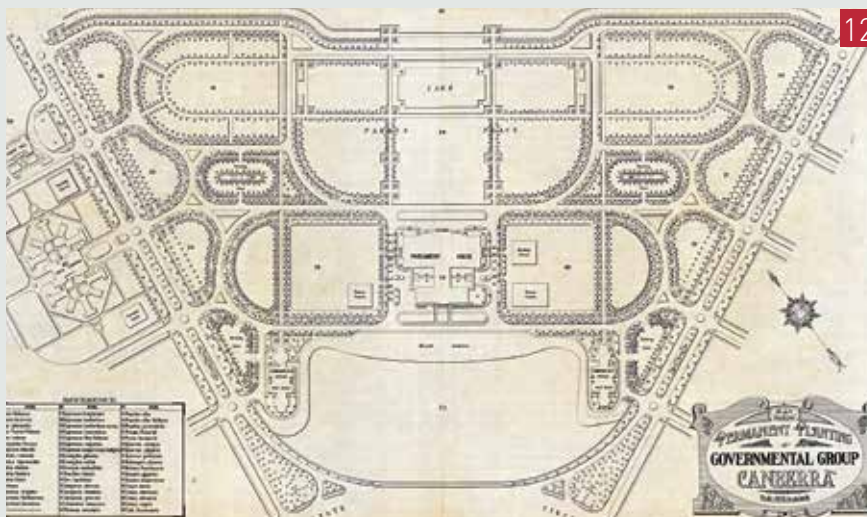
Plan for Permanent Planting around Parliament House between Commonwealth Avenue and Kings Avenue
